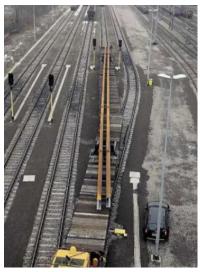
Transport of 60 m steel shape - Dresden site.
